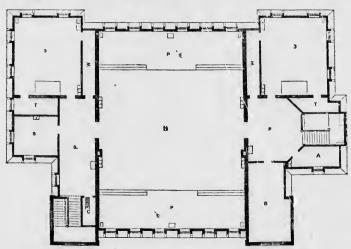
Plan of Third or Attic Storey adapted to Design No. 66.
